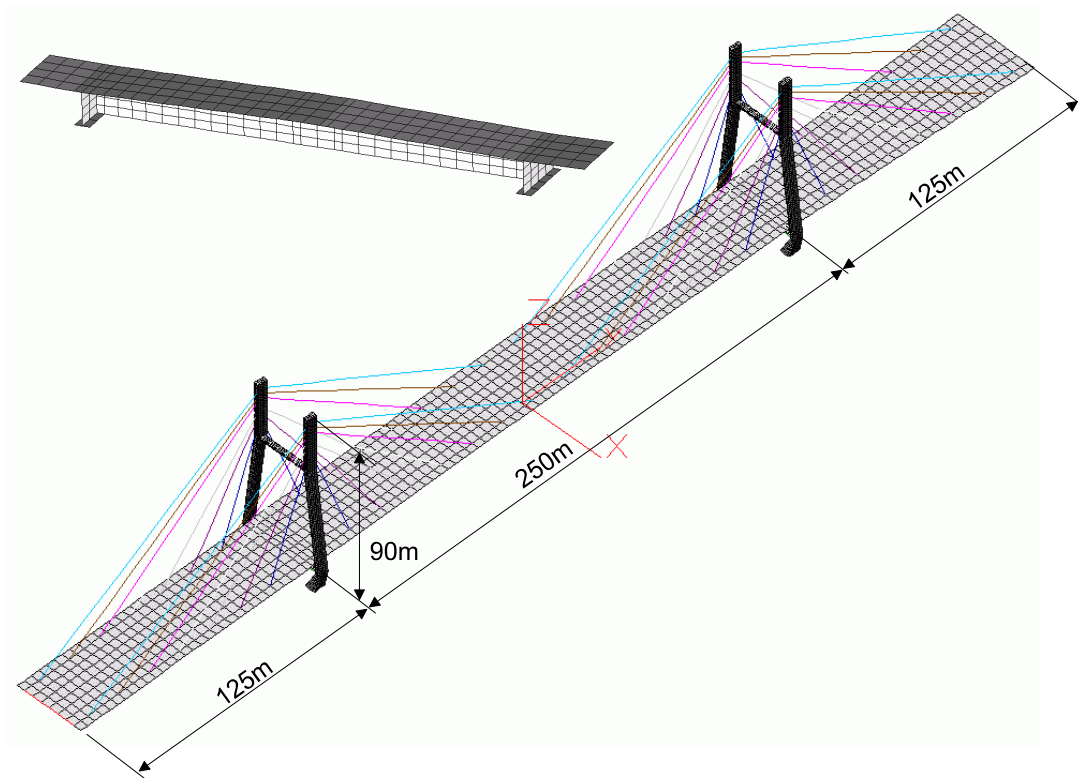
The static scheme of the Siekierkowski Bridge in Warsaw.
